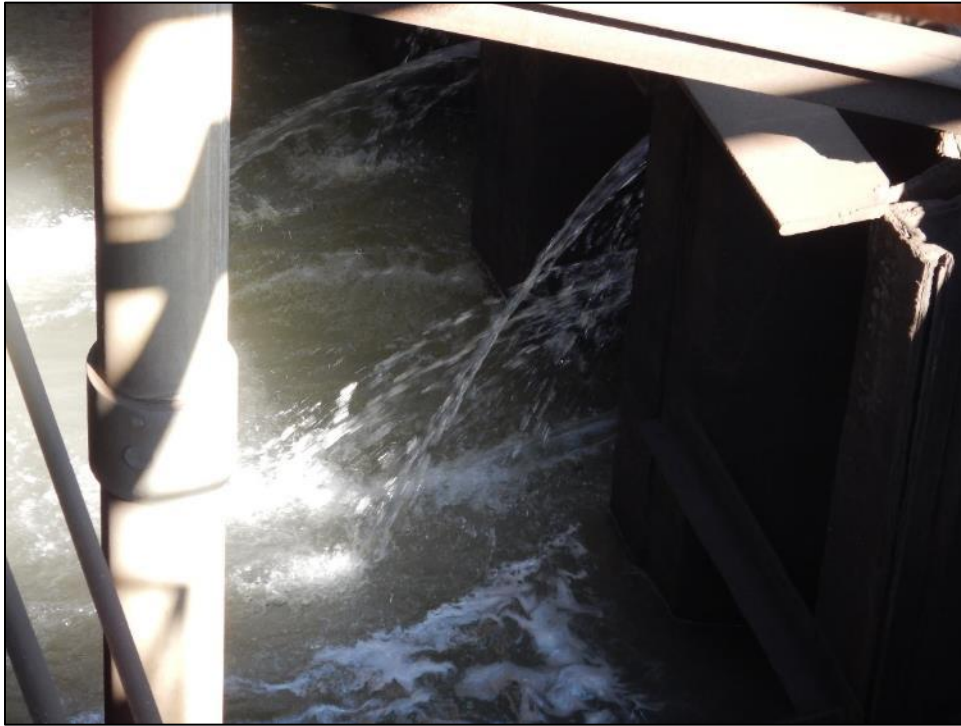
Terminal Treatment Plant West – View, facing southwest, of the treatment plant.
